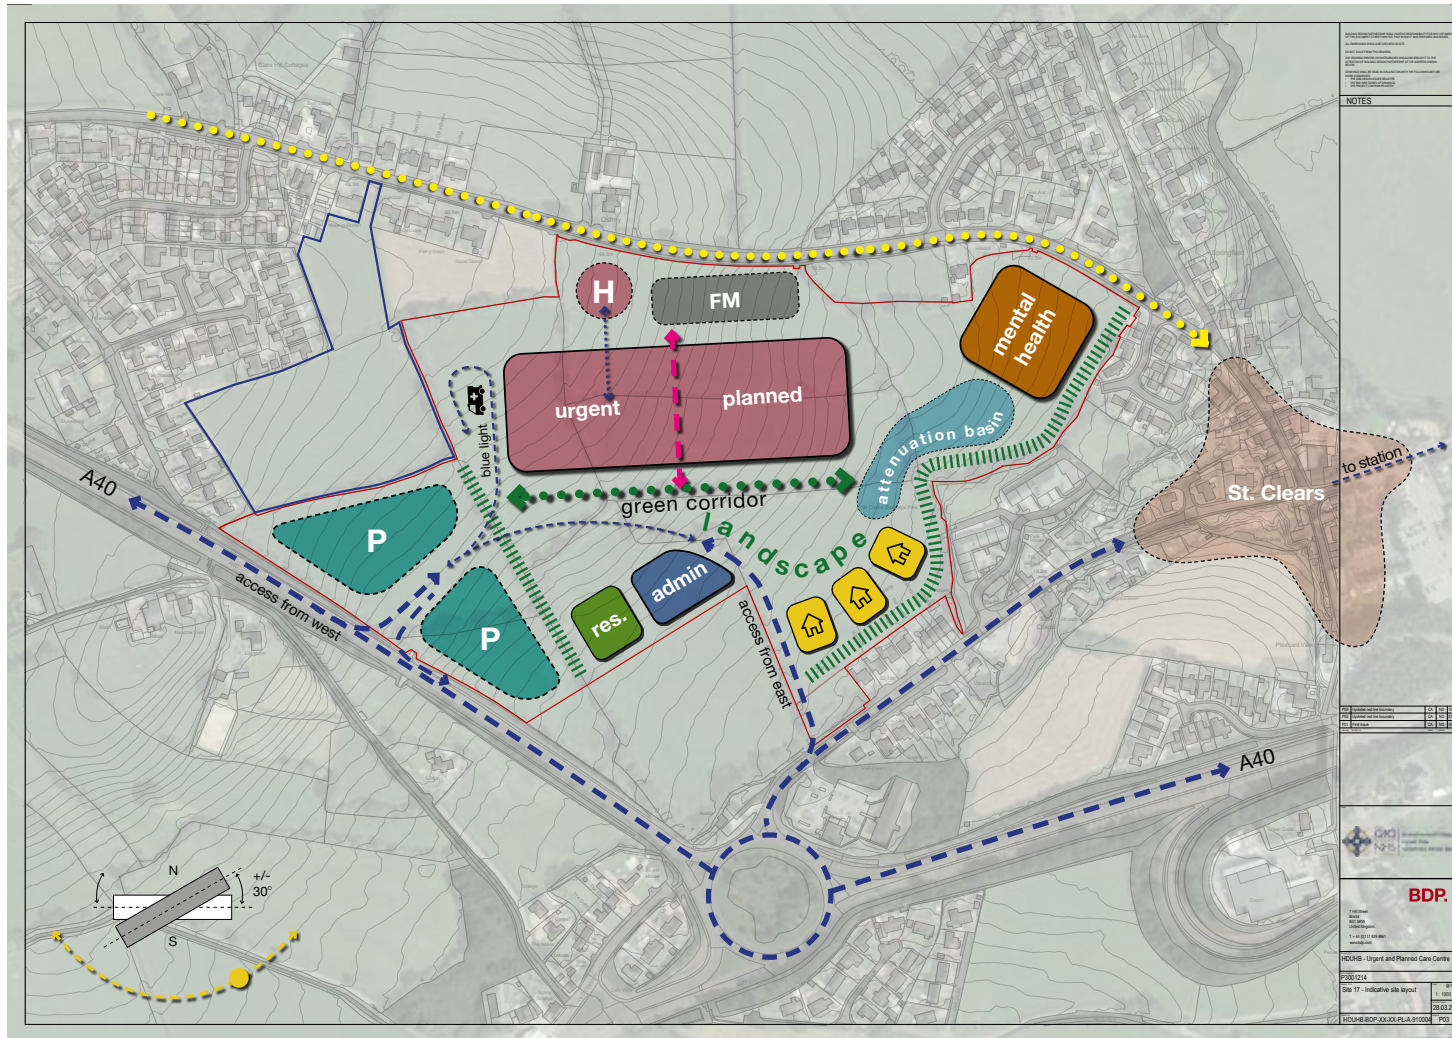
Indicative site layout showing the primary components of the proposed masterplan
